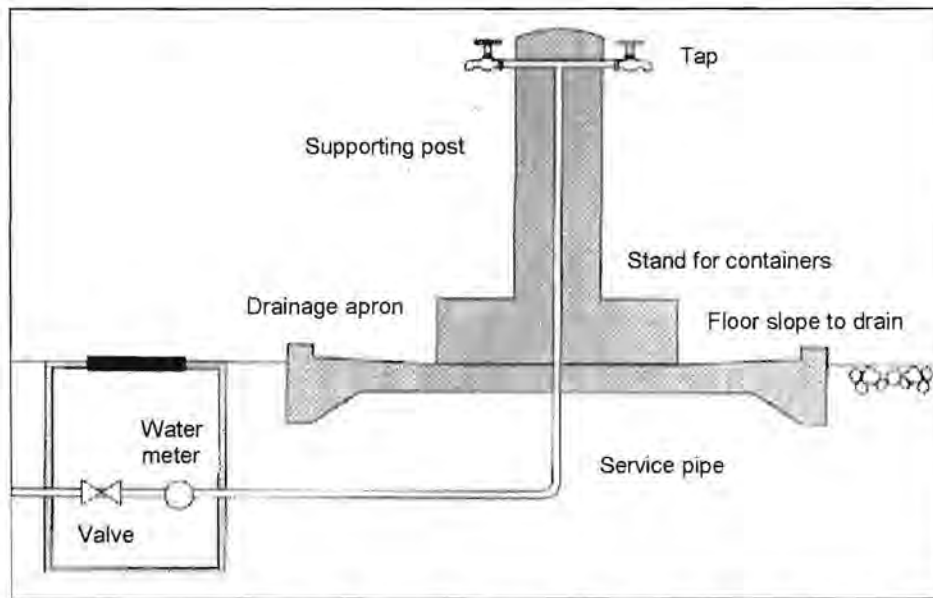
Typical layout of a double outlet standpipe and concrete plinth (Source: Cotton and Tayler, 2000:4.43)
